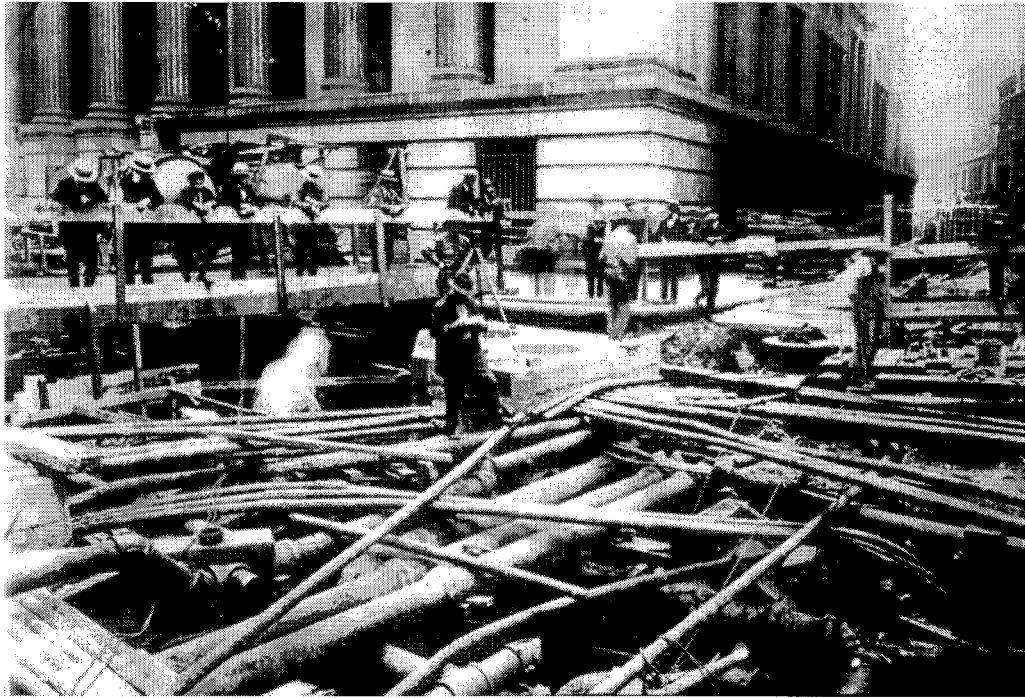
Underground Infrastructure at Wall and Williams Streets in New York City, 1917
